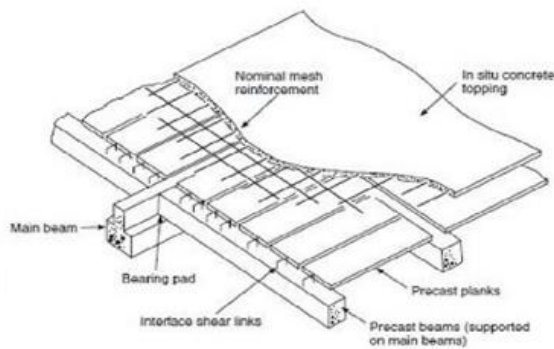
(a) Composite beam and plank floor consisting beams, soffit units and cast in situ topping
